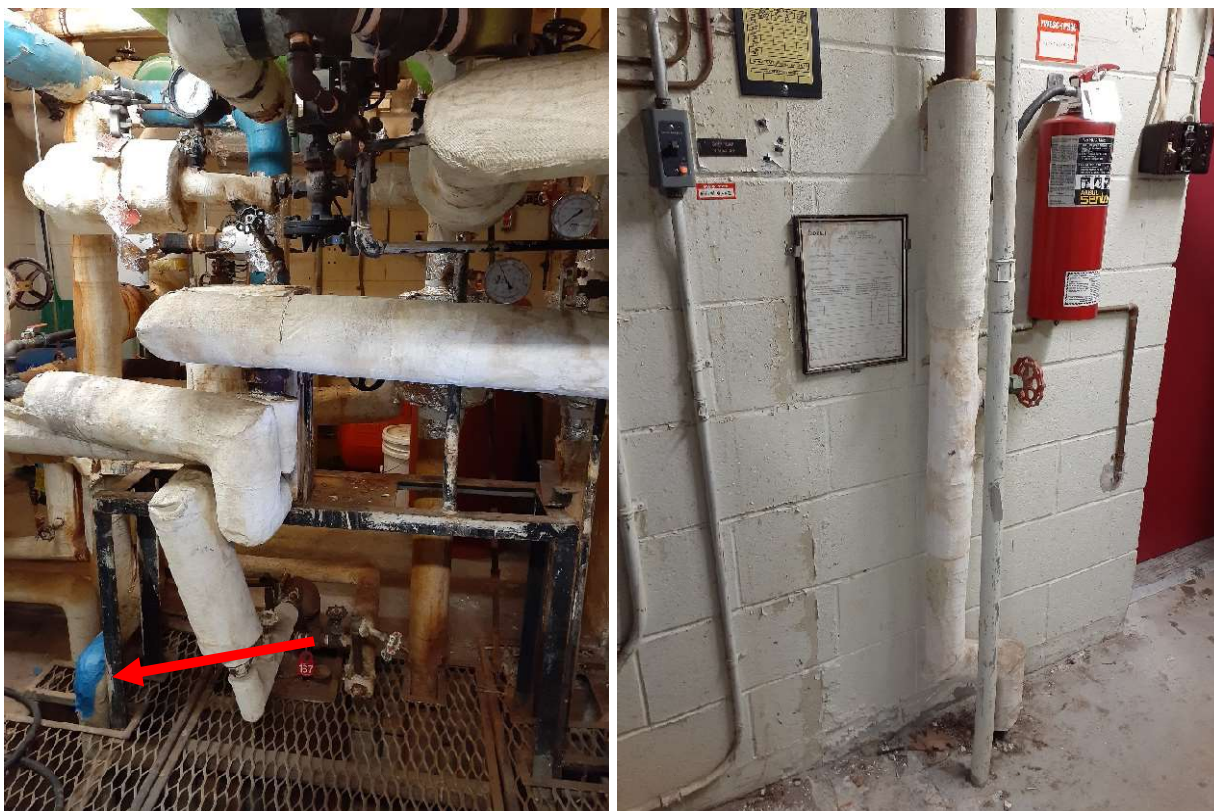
Representative photographs of the Mechanical Room in Building 141. Non-asbestos containing drywall joint compound located on the wall and ceiling [Sample ID: 141-AS-01A-C]. White paint on the wall [Sample ID: 141-LP-01; 1,900 ppm lead] confirmed to contain high levels of lead.
